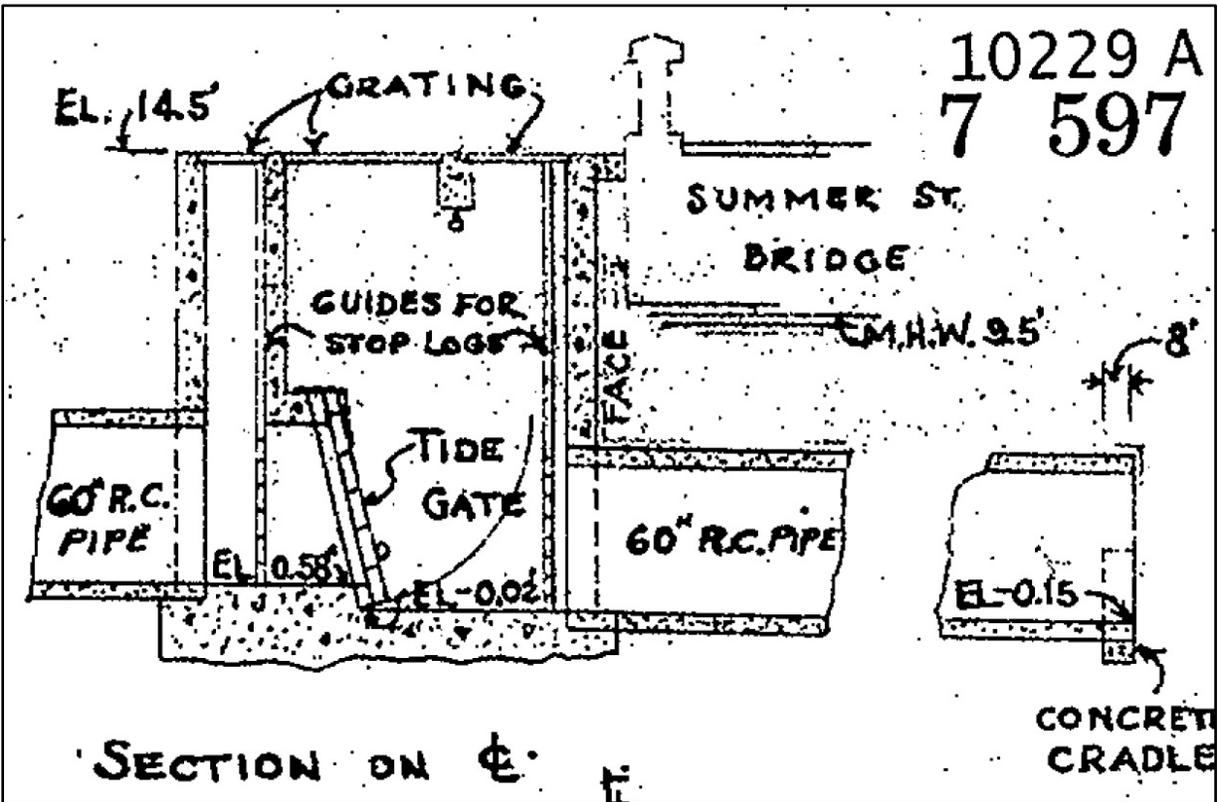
Portion of the 1948 Chapter 91 License Plan for the tide gate that previously existed within the Home Meadows culvert immediately south of Otis Street.
